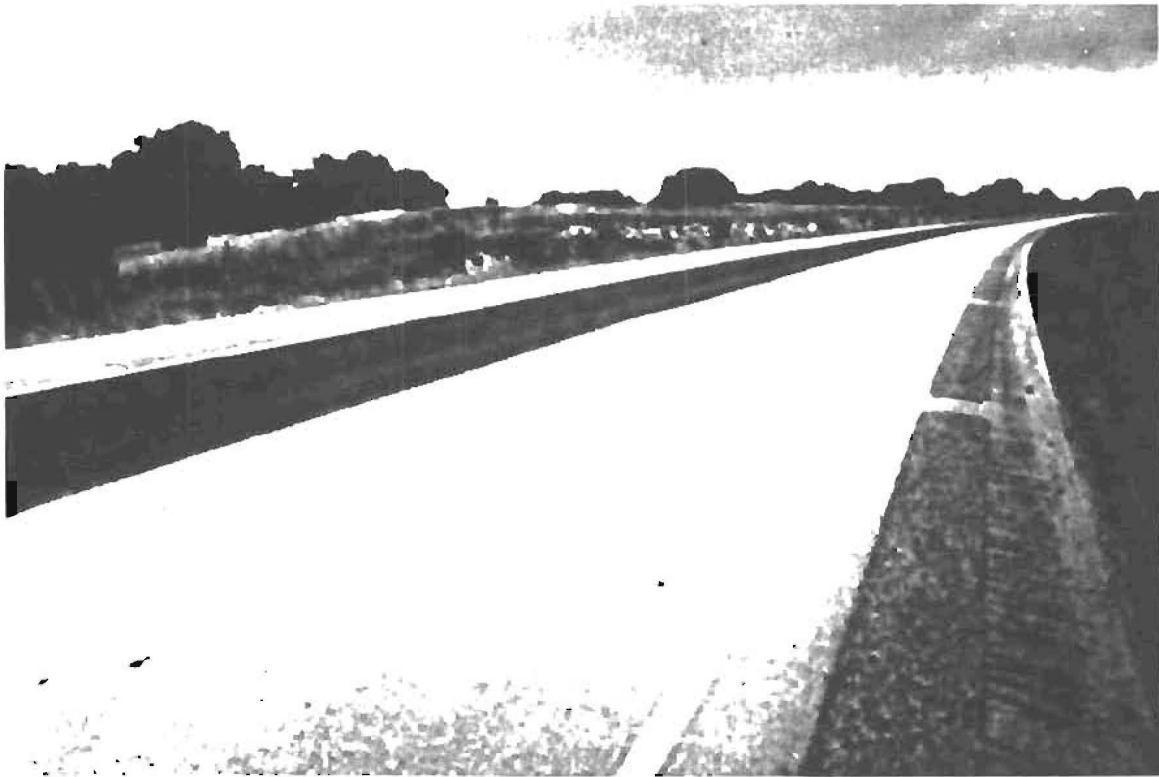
A discontinuous seal coat utilizing large aggregate
